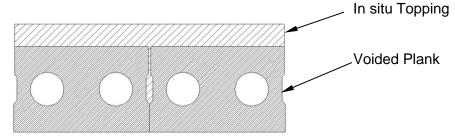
F(1) - TYPICAL CROSS SECTION OF PRECAST VOIDED PLANK
